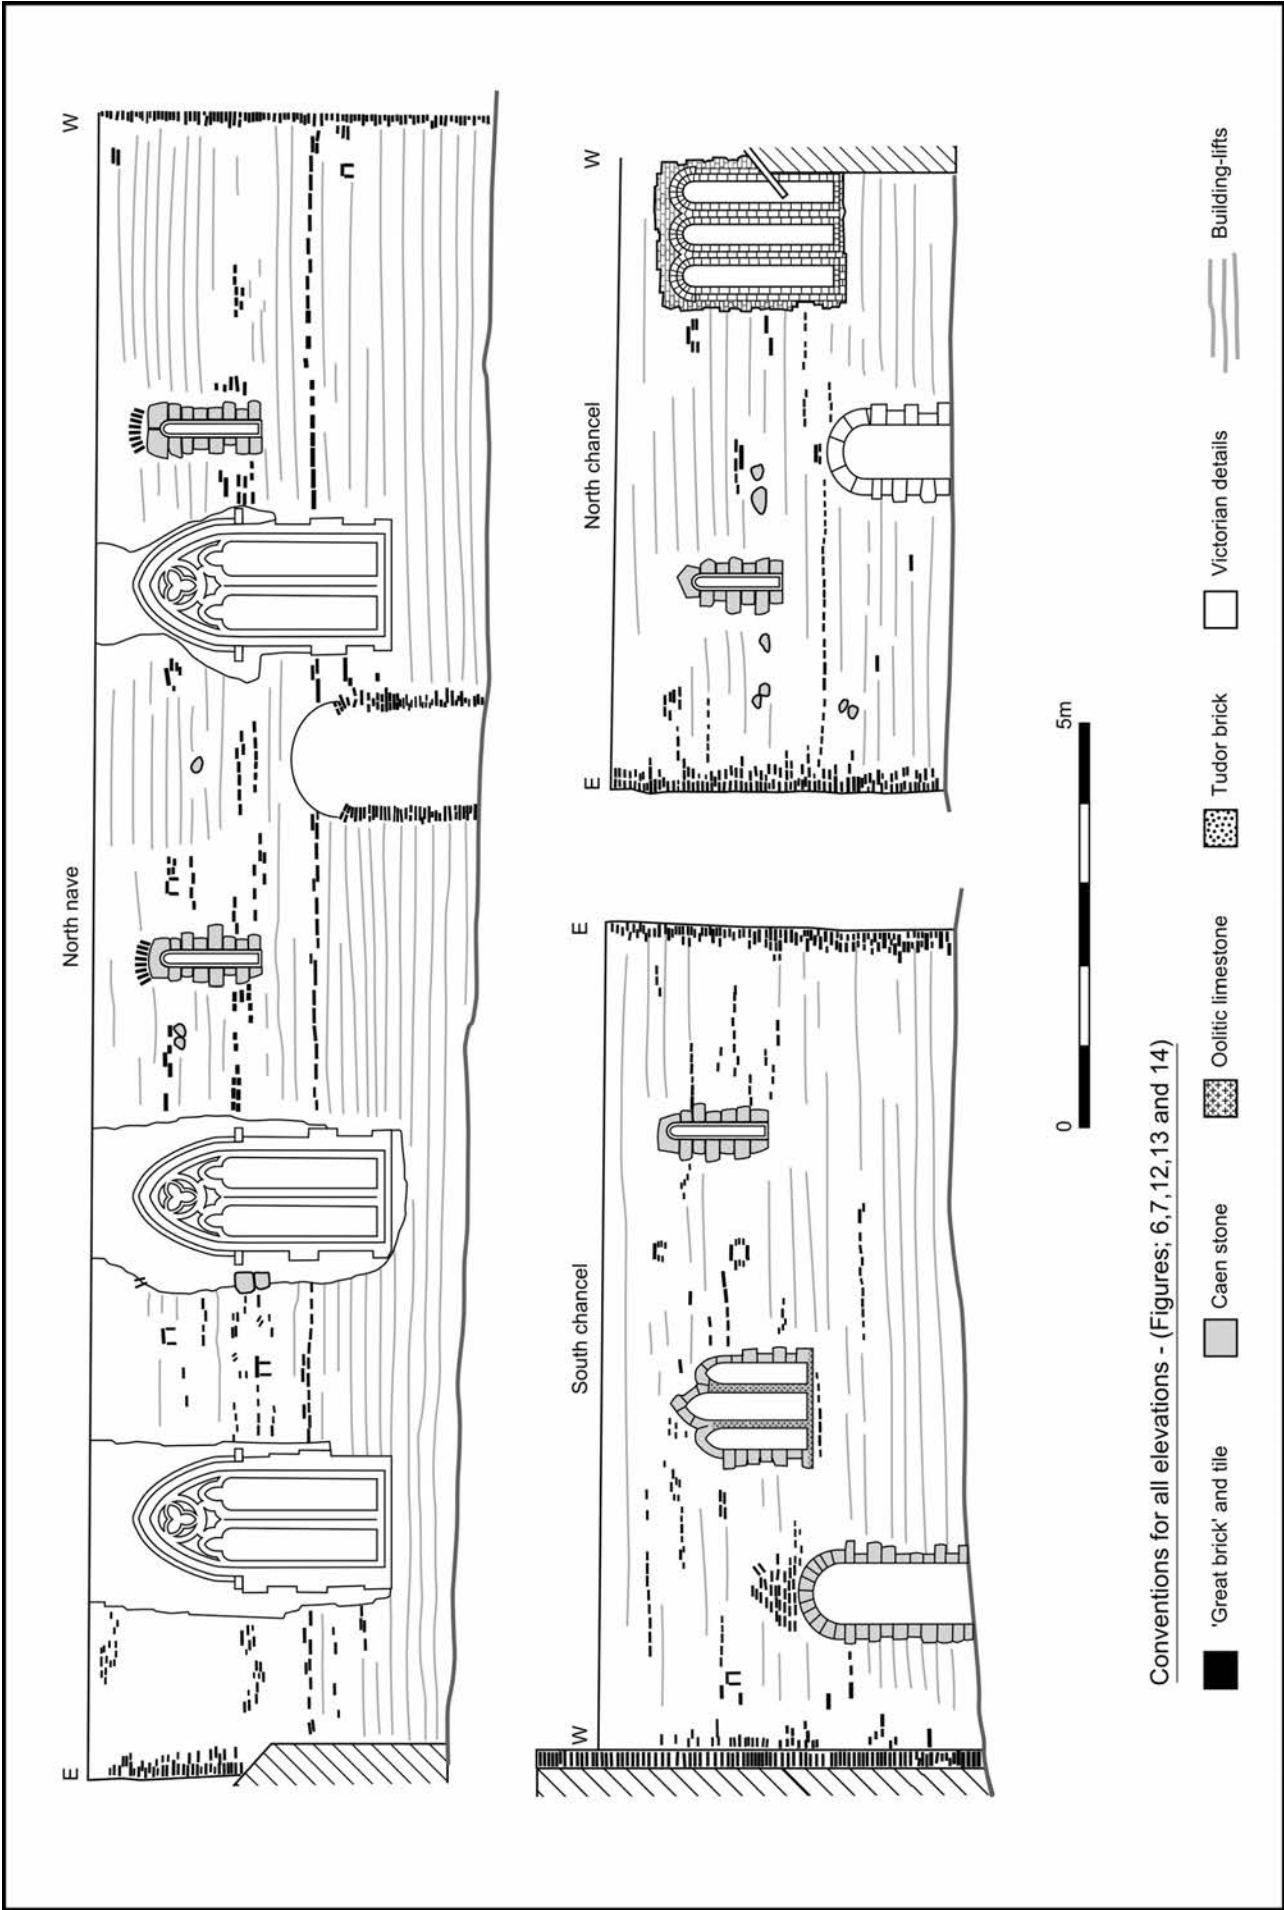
Elevations of north nave wall, south chancel wall and eastern part of north chancel wall
